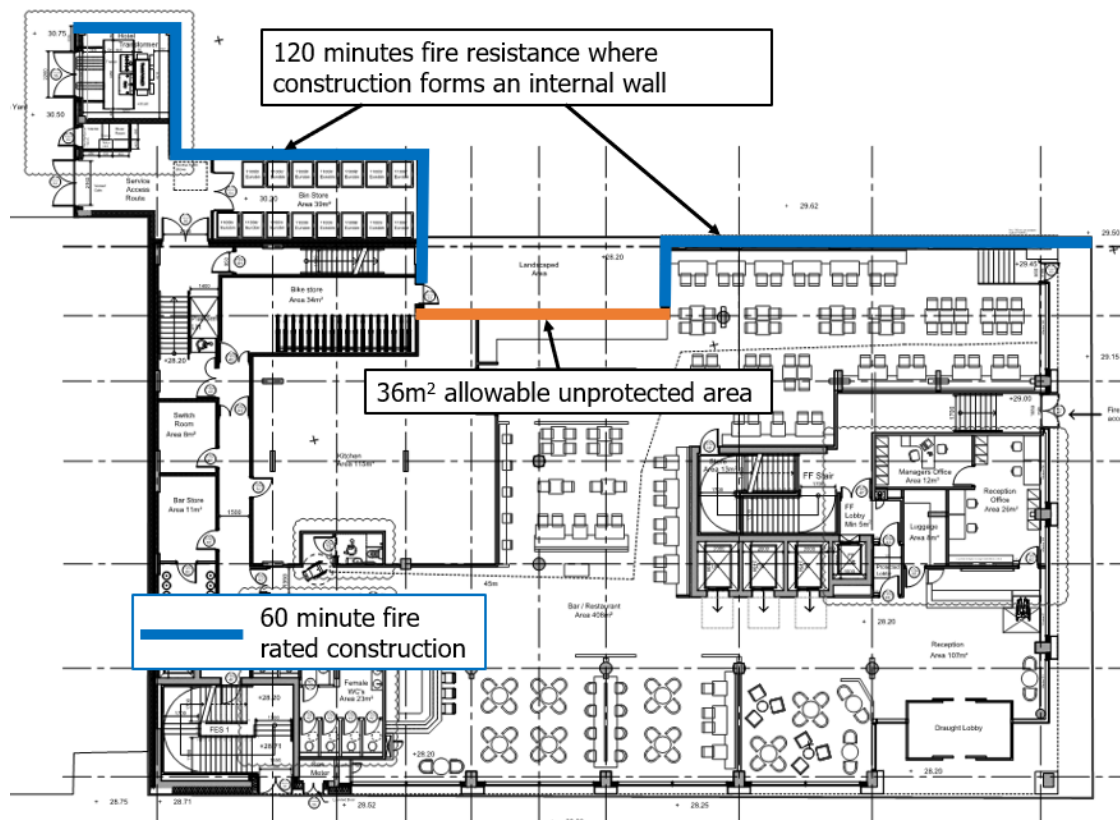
Extent of protection required to the external façades of the hotel building at Ground Floor
